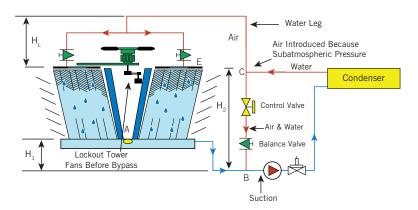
Tower Bypass Can Introduce Air into Pump Suction on Full Bypass - NOT RECOMMENDED
